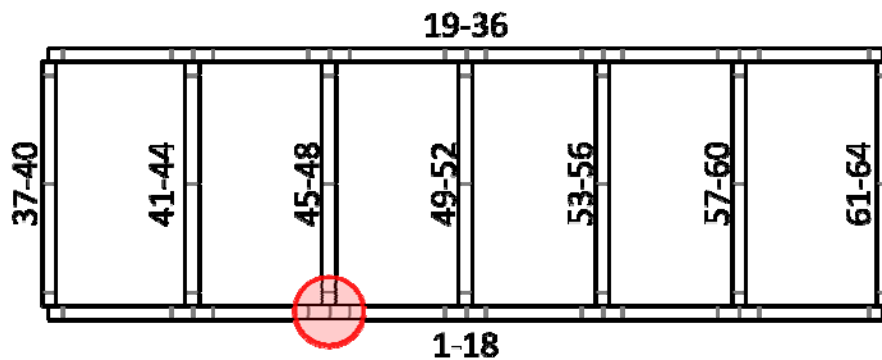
Location of the Damaged Connection for Damage Case 1
